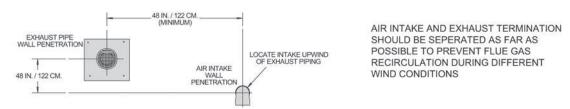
HORIZONTAL INSTALLATION WALL PENETRATIONS
